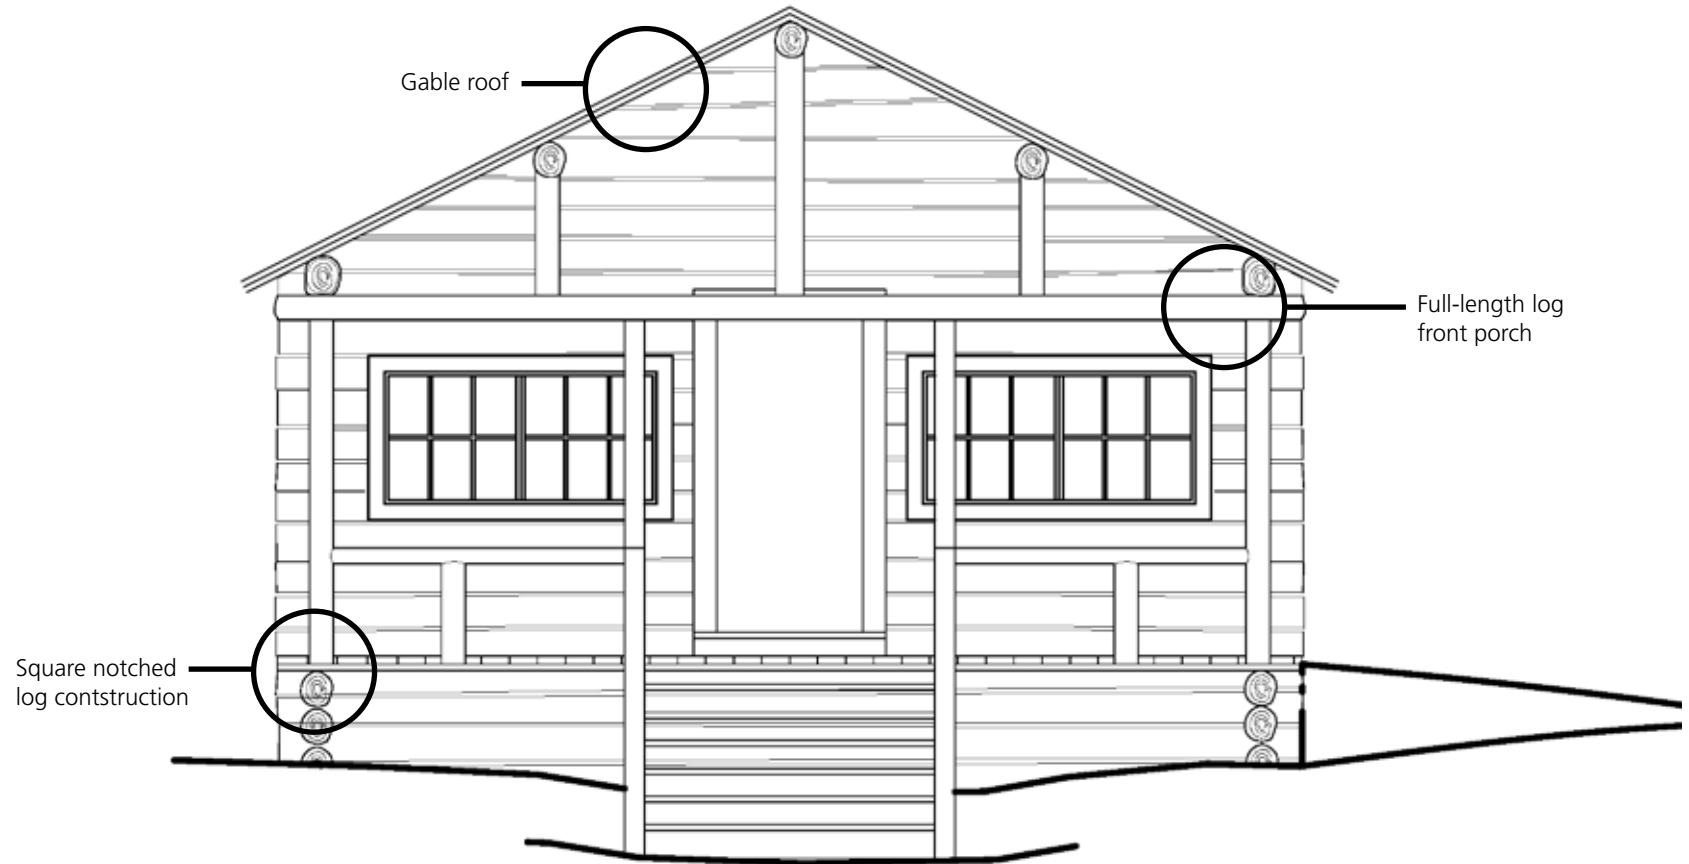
Building 22, East Elevation, Historic American Building Survey, W. Vandeventer and Dave Snow, 1986 (NPS Alaska Regional Office files)
